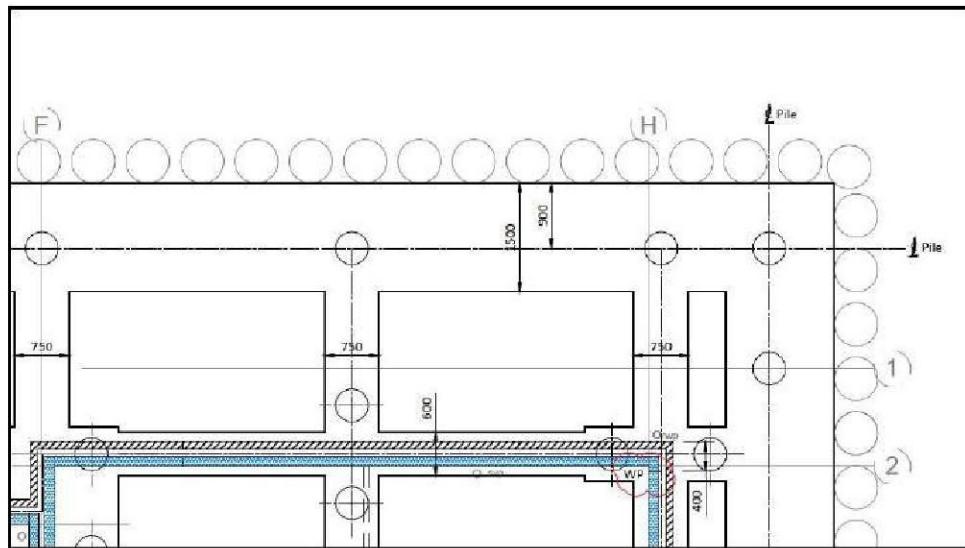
shows extract of similar scheme where ground beams act as props to a piled retaining wall and brace the wall into the main structure to ensure deflections within limits.
